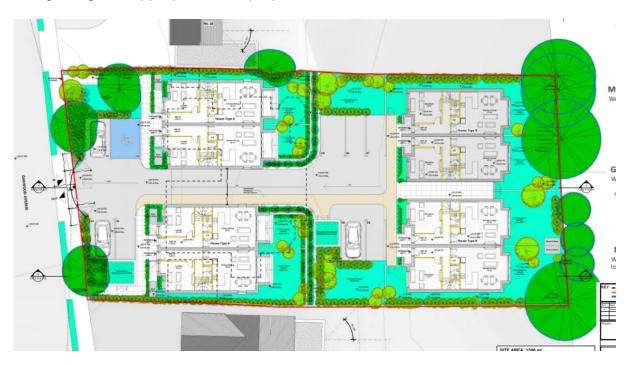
Proposed site plan showing proposal in relation to neighbouring properties.
